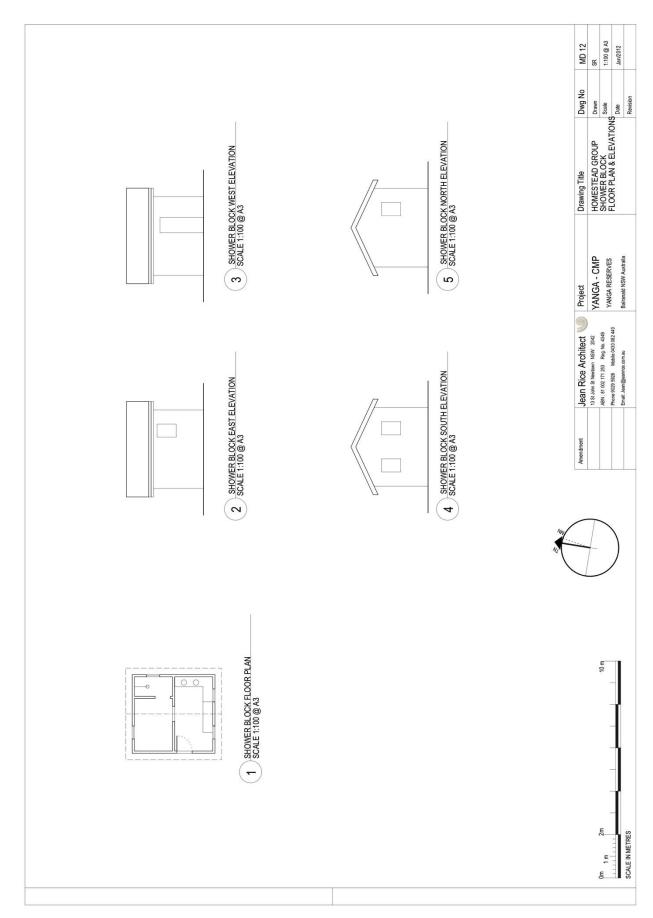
Homestead Group Shower Block plan & elevations. Jean Rice Architect, site assessment 2009.
